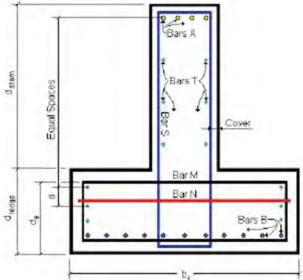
Section View for T Bars of 0 Degree Skewed ITBC
